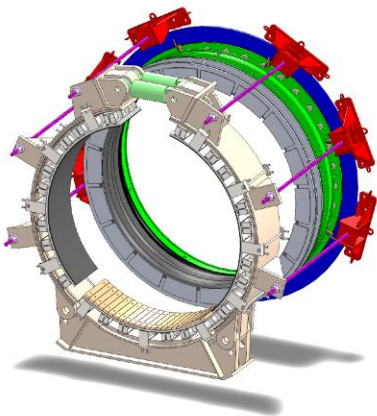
Pipe Brake and Launching Seal Unit with Emergency Seal System
